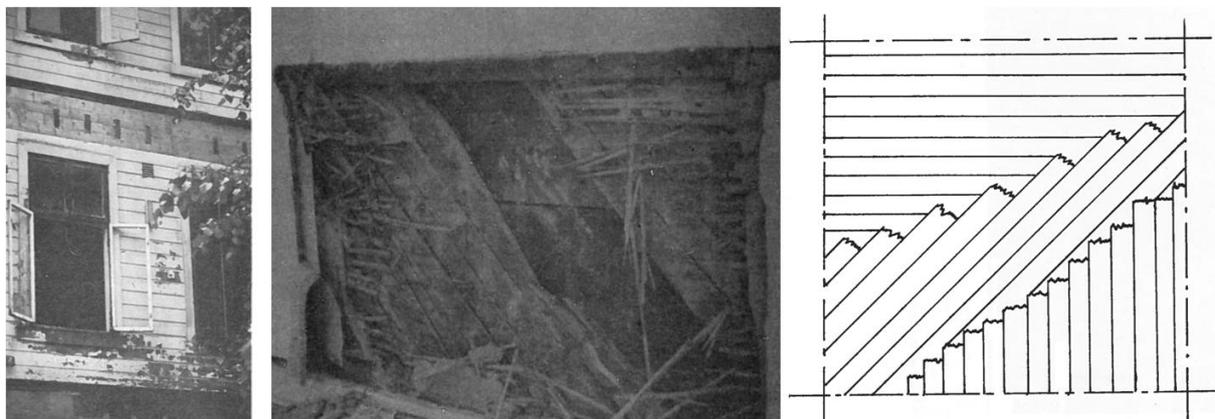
Exterior wall of a building retrofitted in the 1970s to the left. The photo in the middle and the figure to the right show the wooden materials of the exterior wall which is composed of three layers of wooden planks covered with straw and plaster on the interior. The exterior of the wall was covered by a tar paper and wooden cover boarding (Peterson *et al.*, 1982).
